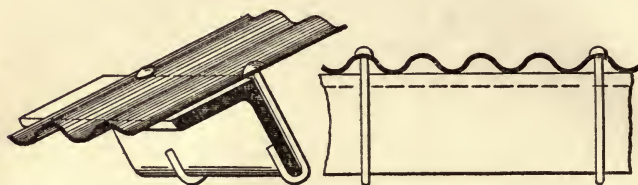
Clinch Nail Fastening for Corrugated Iron Roofing.
